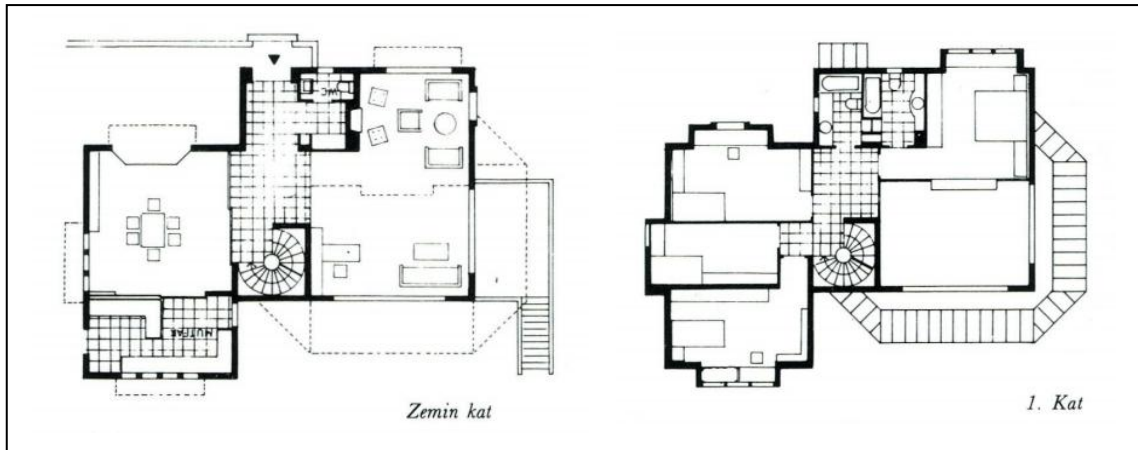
Floor plans of Bayramođlu houses type 1 (Gorbon and Dinçer, 1989) [93]
